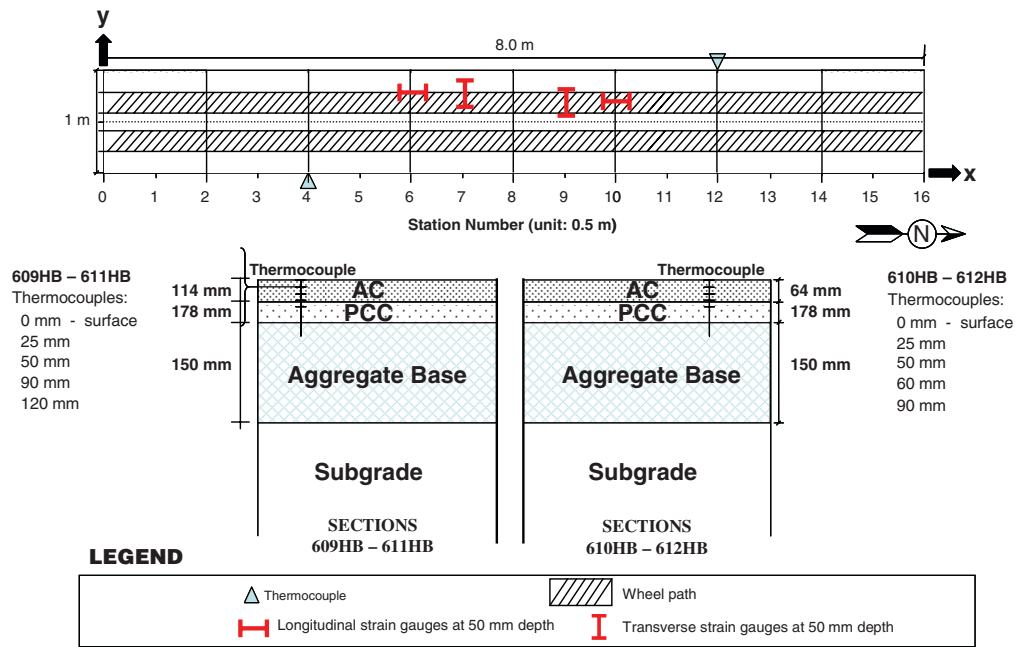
HVS rutting test section layout and location of thermocouples.
